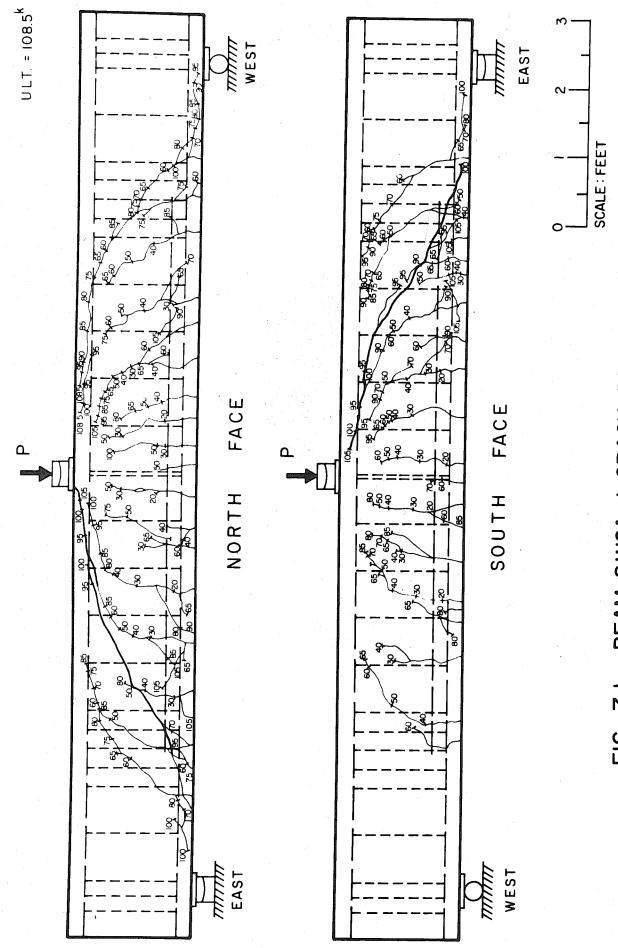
J BEAM 2WCA-I CRACK PATTERN
